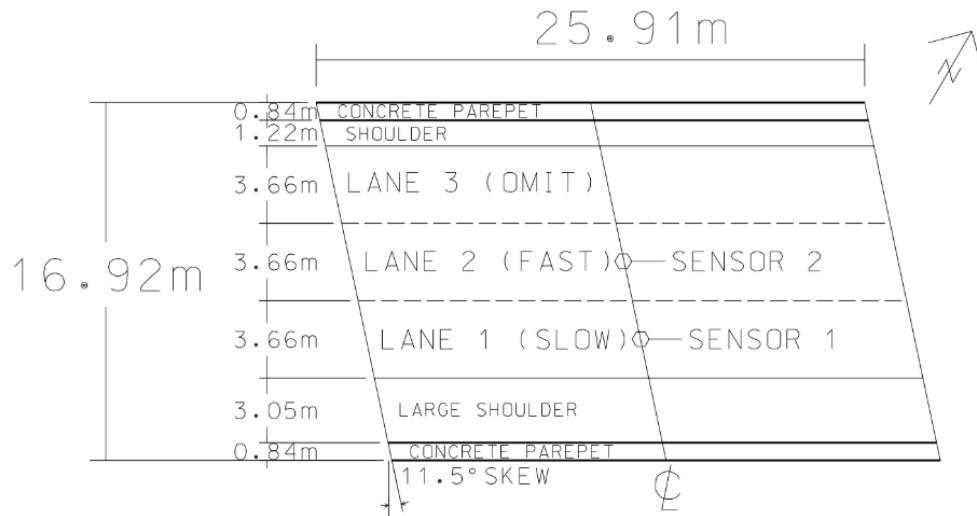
Meriden Bridge Plan View (Wall, *et al.*, 2009)
